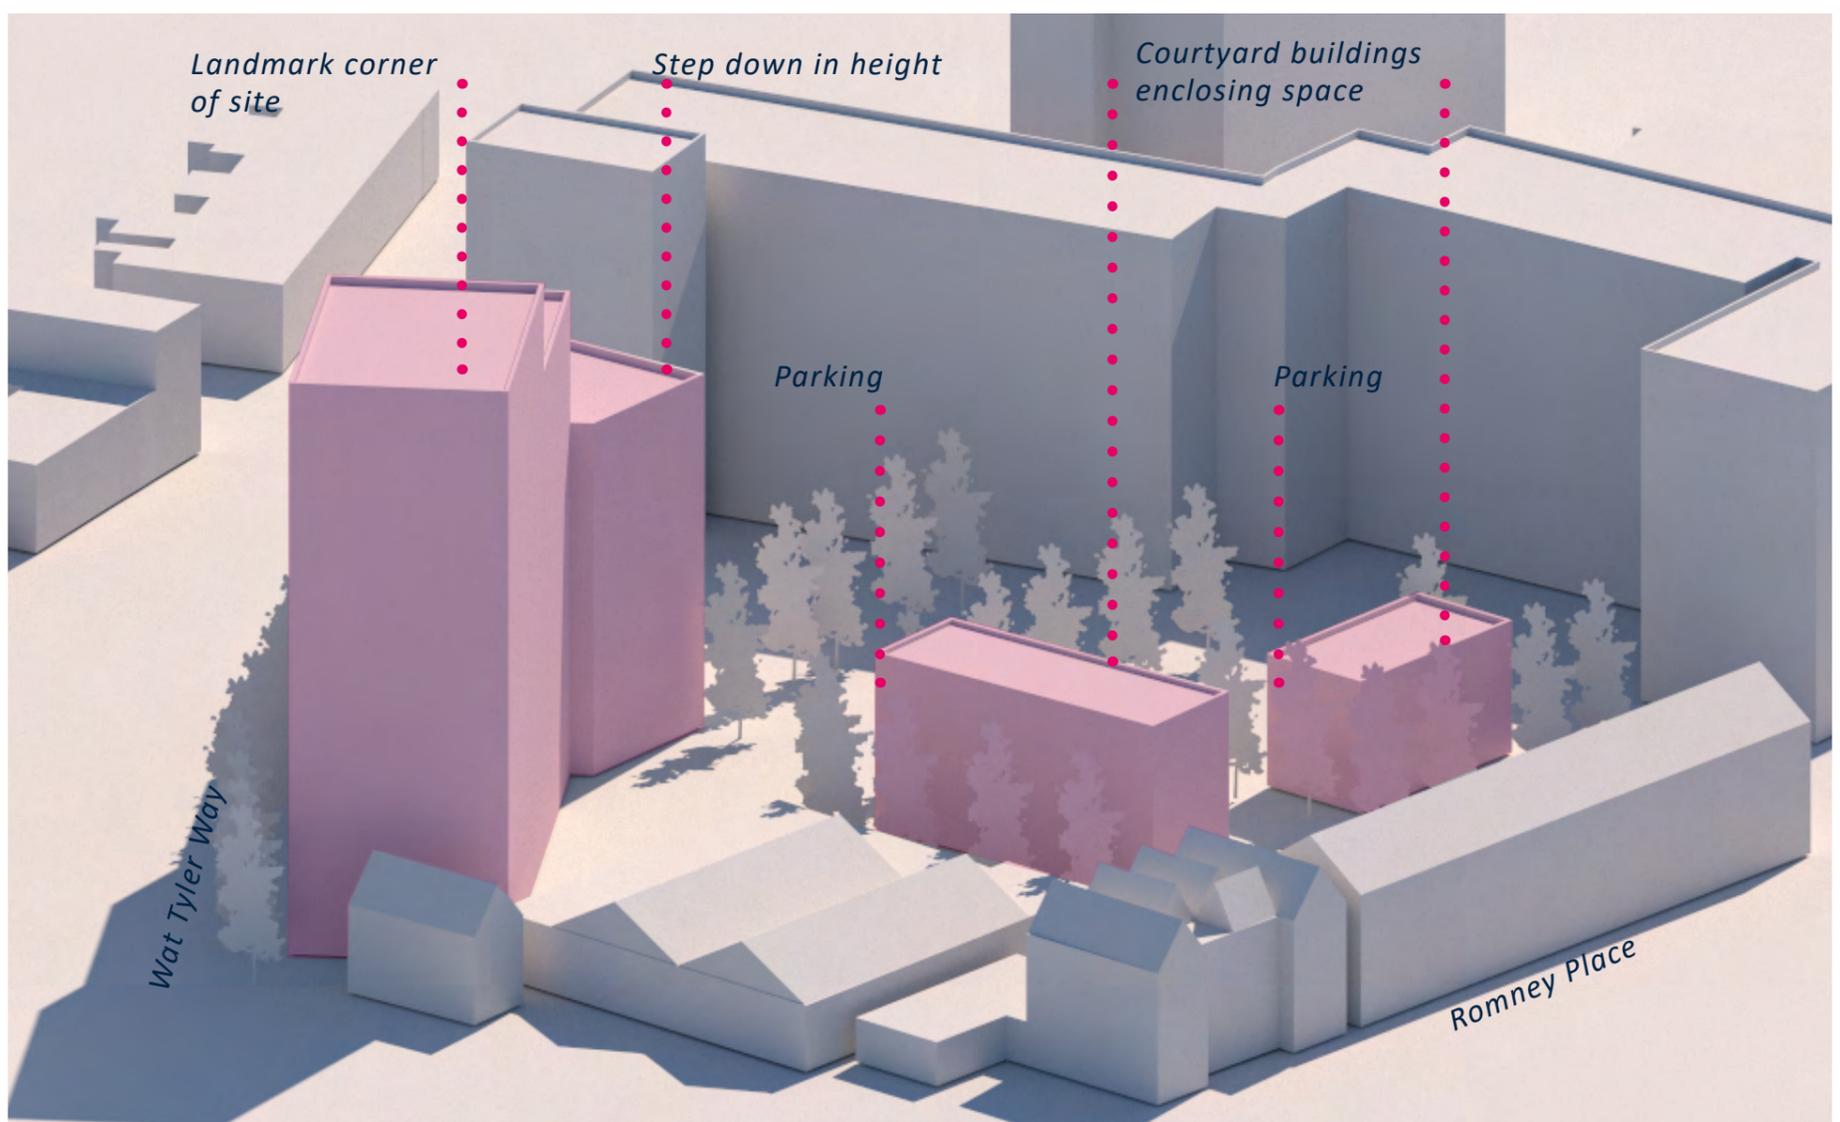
Model showing proposed massing of an illustrative scheme with buildings up to 13 storeys in height
